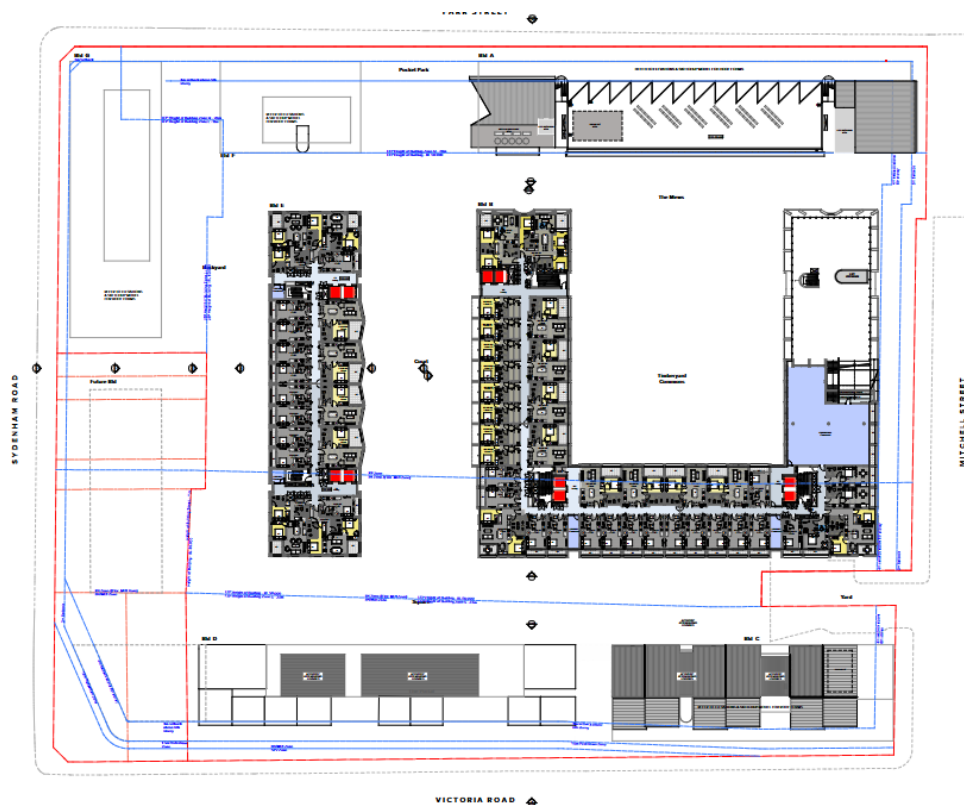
Extract of proposed plans showing mid-levels, 1-6.
